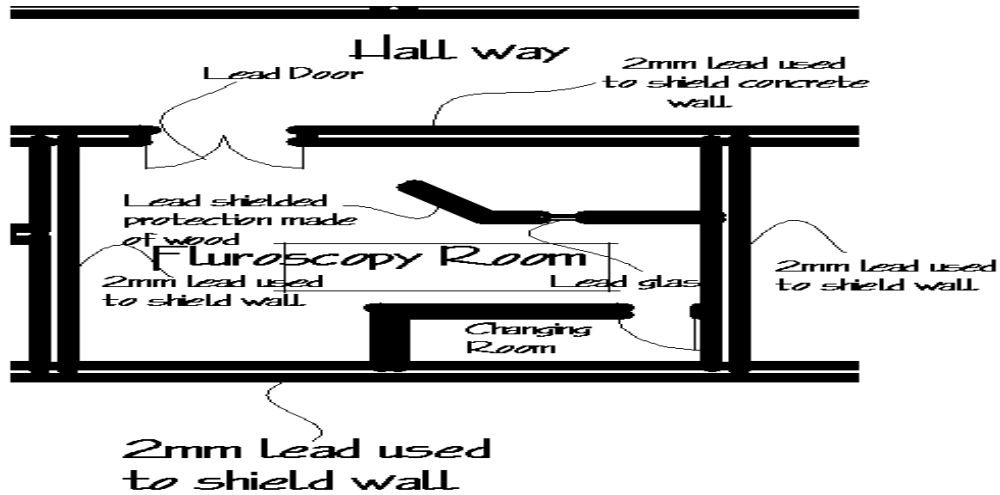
Sketch showing the Floor Plan x-ray room.
